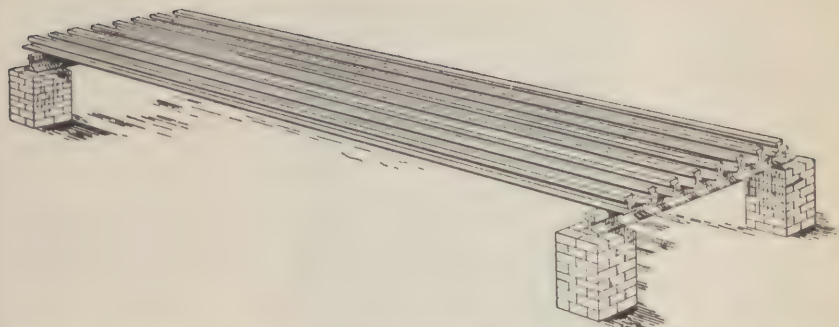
Manure incinerator consisting of grid made of railroad rails elevated on brick piers.
